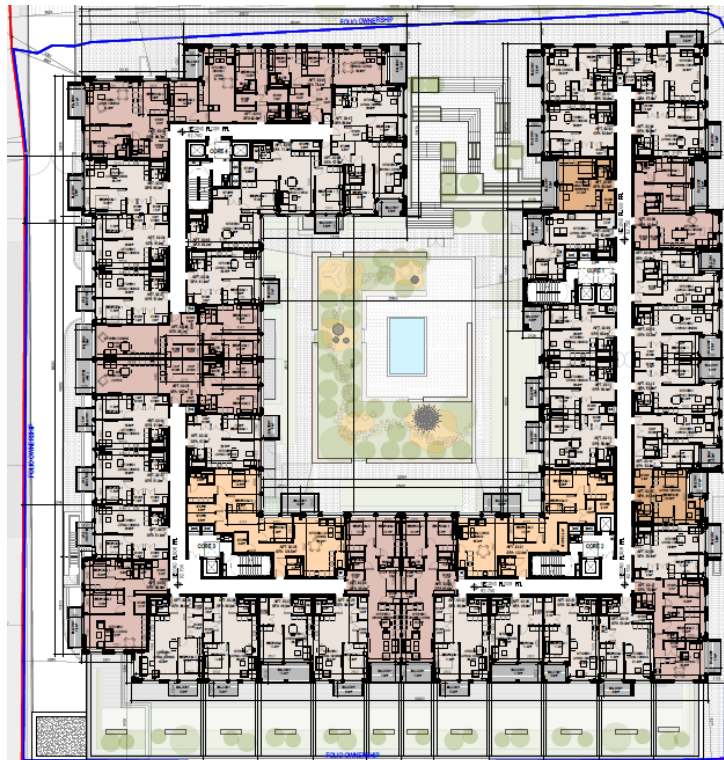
Second floor plan. 2 no. studio apartments, 33 no. one-bedroom apartments, 10 no. two-bedroom apartments and 2 no. three-bedroom apartments are provided at this level.
